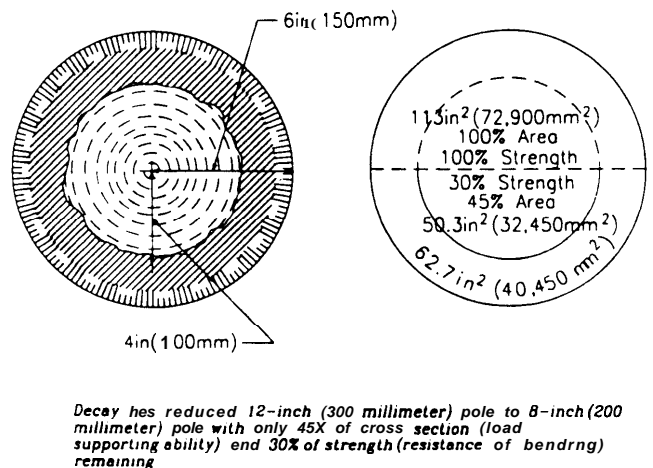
Twelve-inch (300-millimeter) pole with 2-inch (50-millimeter) surface decay
